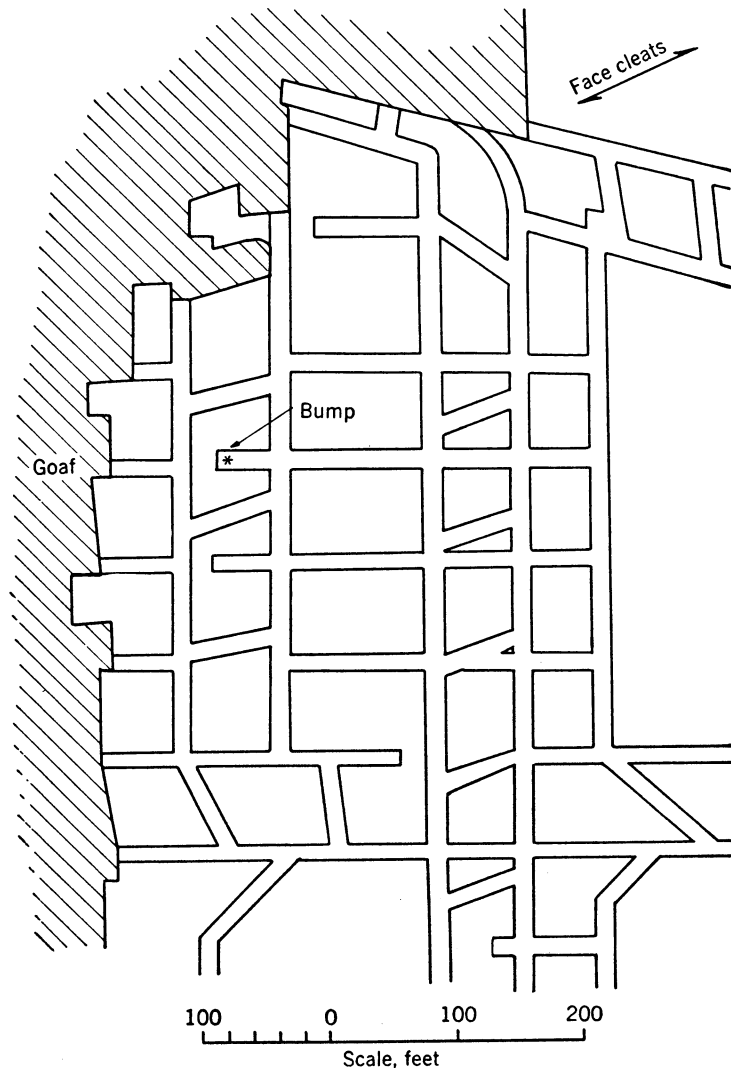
Bump on a Pillar-Line Point Where a Place Was Being Driven Through the Abutment Area Toward the Extraction Line.
